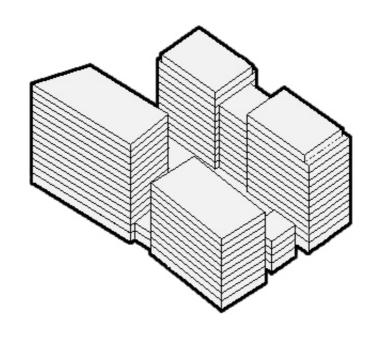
Illustrative building massing must maximise views over Madingley Gardens and up towards Cambridge Road.
